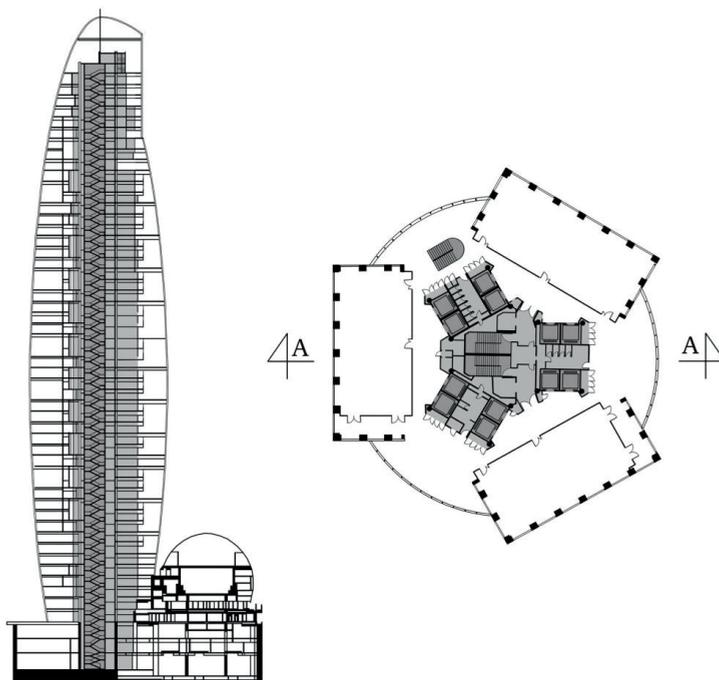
Mode Gakuen Cocoon Tower: plan and section, developed by authors [16]
